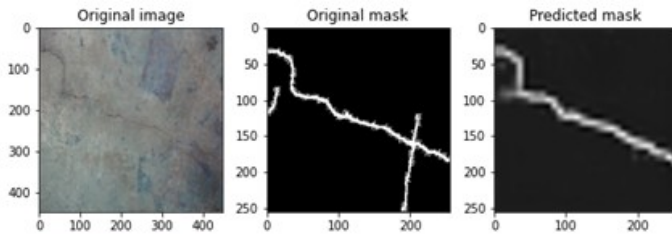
Transverse crack detection: The network accurately segments horizontal cracks across the concrete surface.
